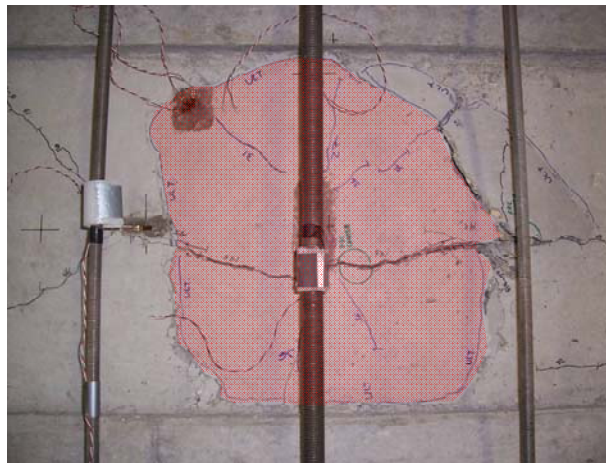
Punch through failure surface (shaded) with girder at top and bottom.
